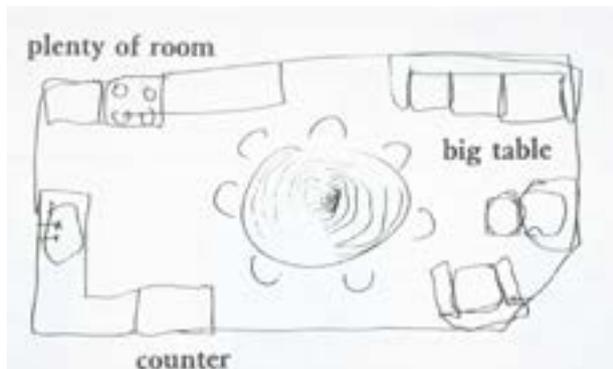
Christopher Alexander, sketch for a farmhouse kitchen from *A Pattern Language. Towns - Buildings - Construction*, New York 1977
